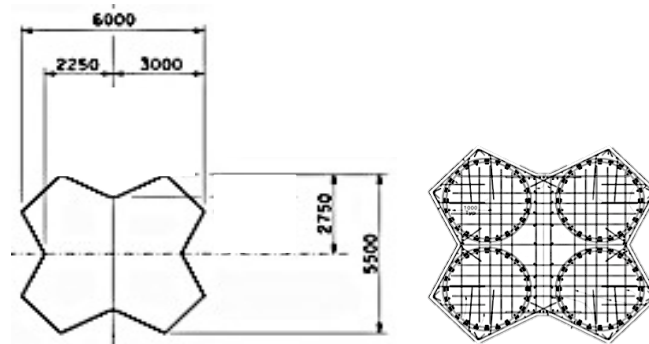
East pier cross section with dimensions (mm) and with rebar's detail (Ref.: Caltrans).
